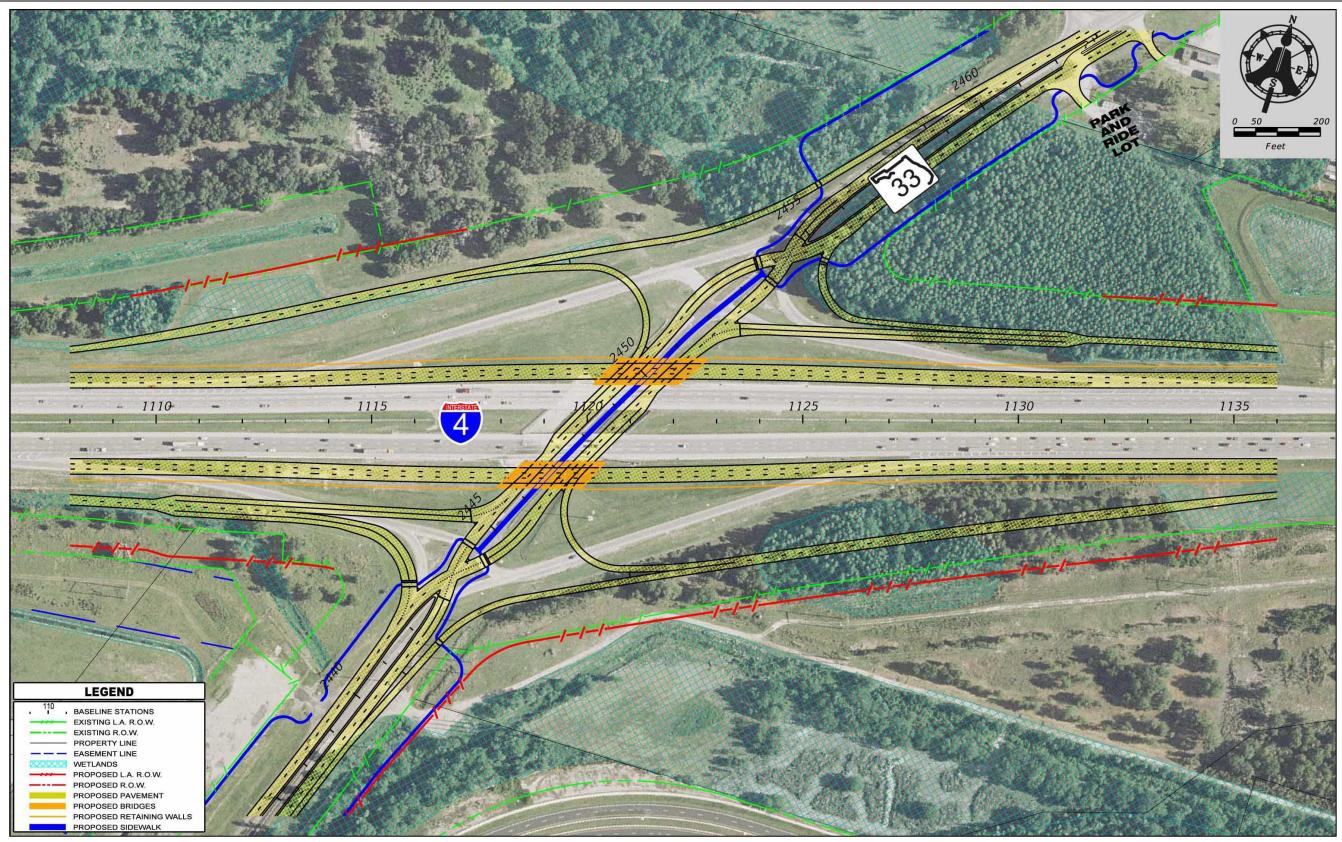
BUILD ALTERNATIVE NO. 2 (DIVERGING DIAMOND INTERCHANGE)
